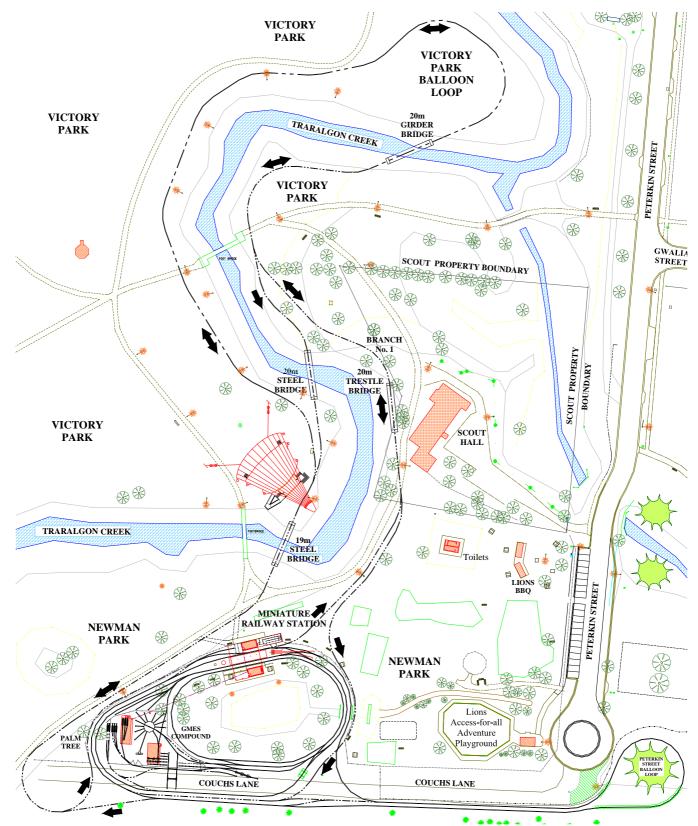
Proposed Victory Park Branch Miniature Railway Extension
